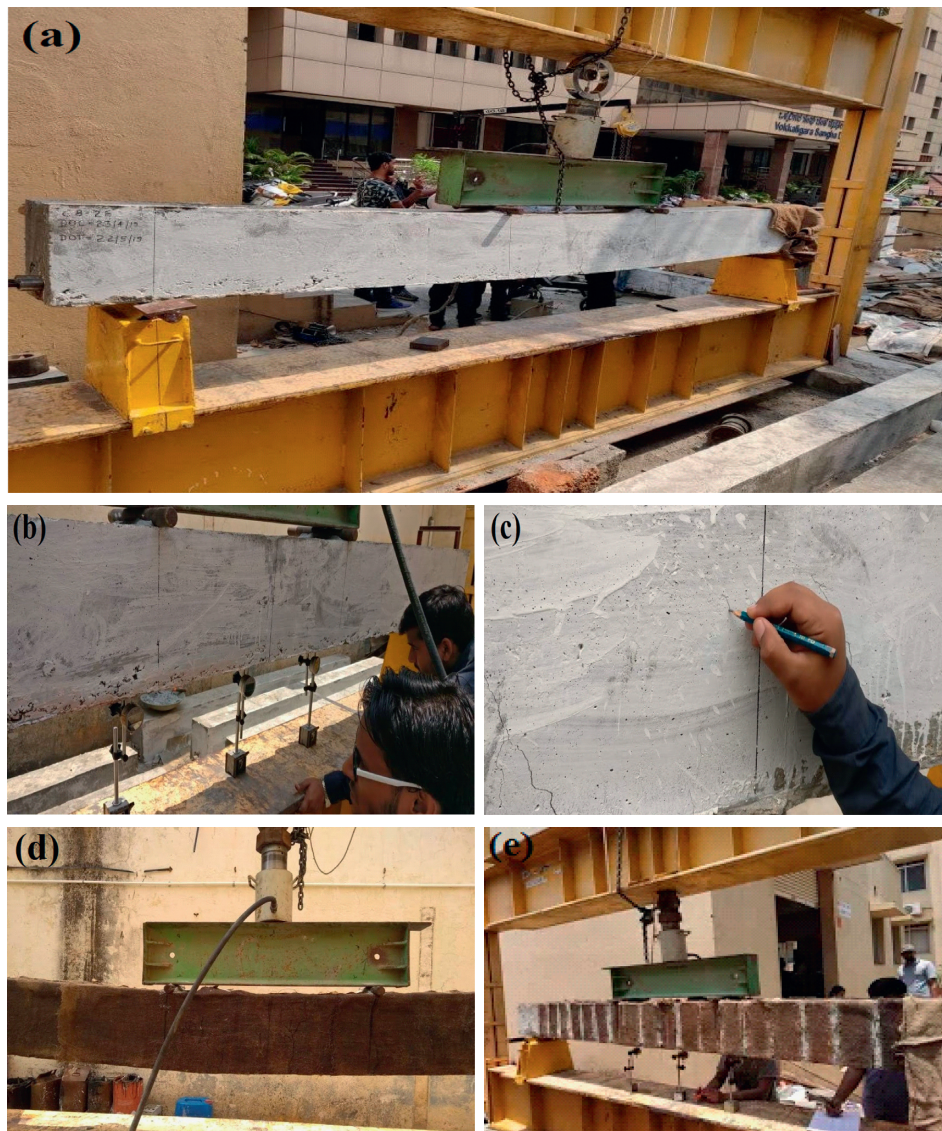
(a) Control beam placed on the loading frame. (b) Dial gauge measurements. (c) Crack on CB. (d) Jute fibre FW. (e) Jute fibre SW.
